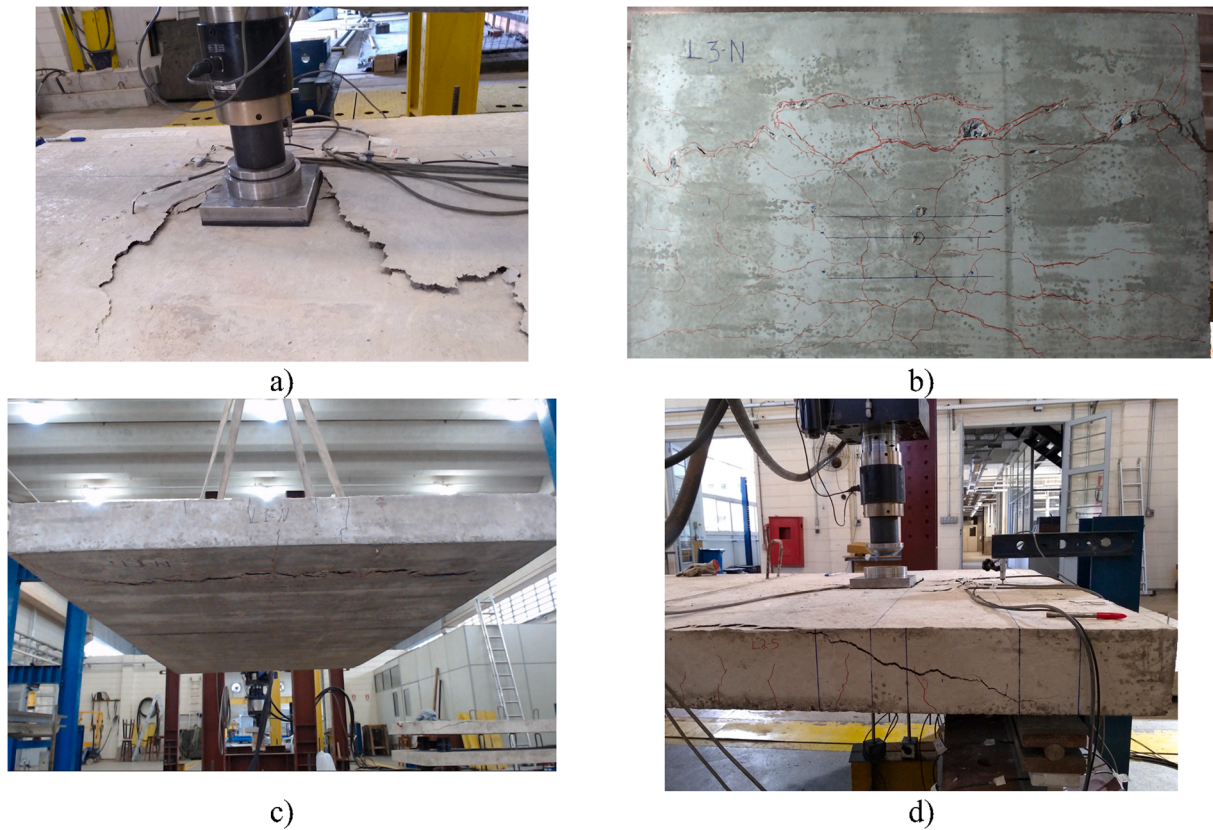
Details of the cracking pattern of the slabs: (a) punching cracks at the top side of the slabs (P); (b) cracking at the bottom side of the slab L3-N; (c) detail of the crack opening close to the support for L1-N; (d) example of shear cracks from wide beams (WB) visible at the slab sides of the test L2-S.
